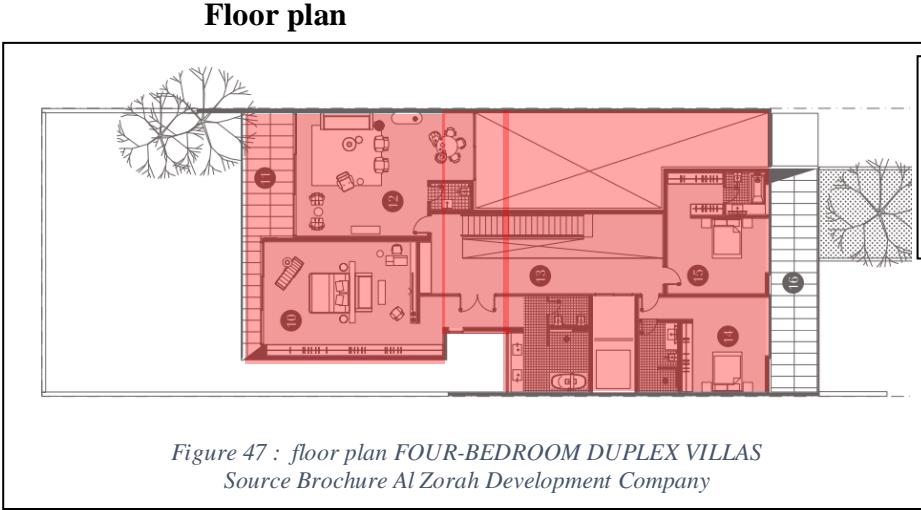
floor plan FOUR-BEDROOM DUPLEX VILLAS
